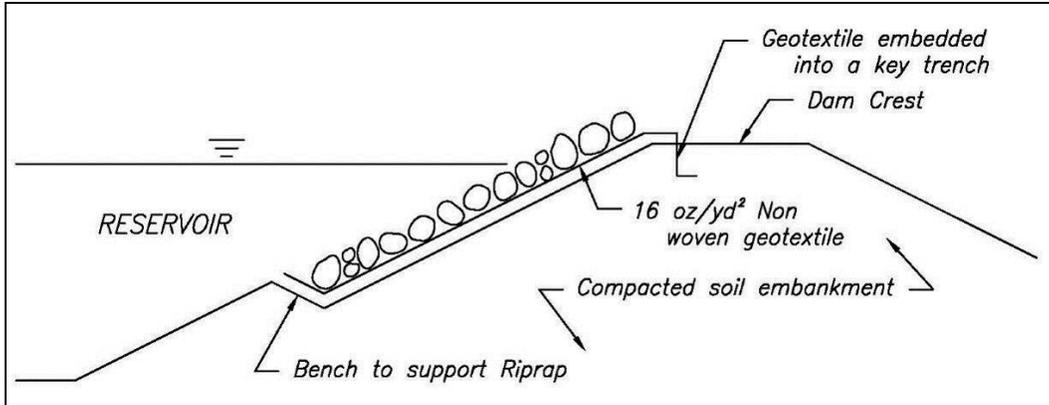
Illustration of riprap on geotextile bedding at a small dam in Arizona. This installation experienced a slope failure. The riprap slid along the interface between the riprap and the underlying geotextile.
